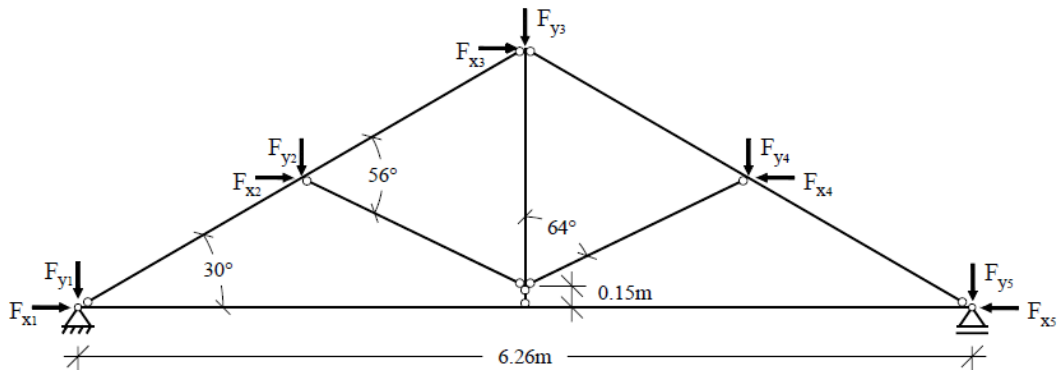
Model adopted for the traditional Portuguese roof structure
